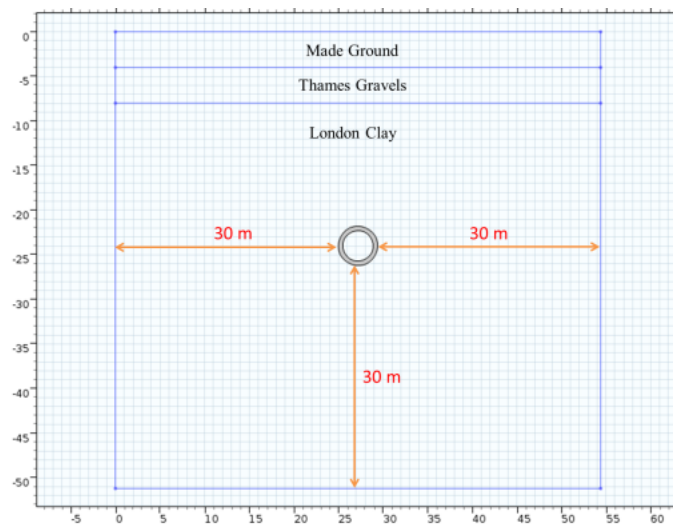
Distance between tunnel wall and lateral and bottom boundaries
